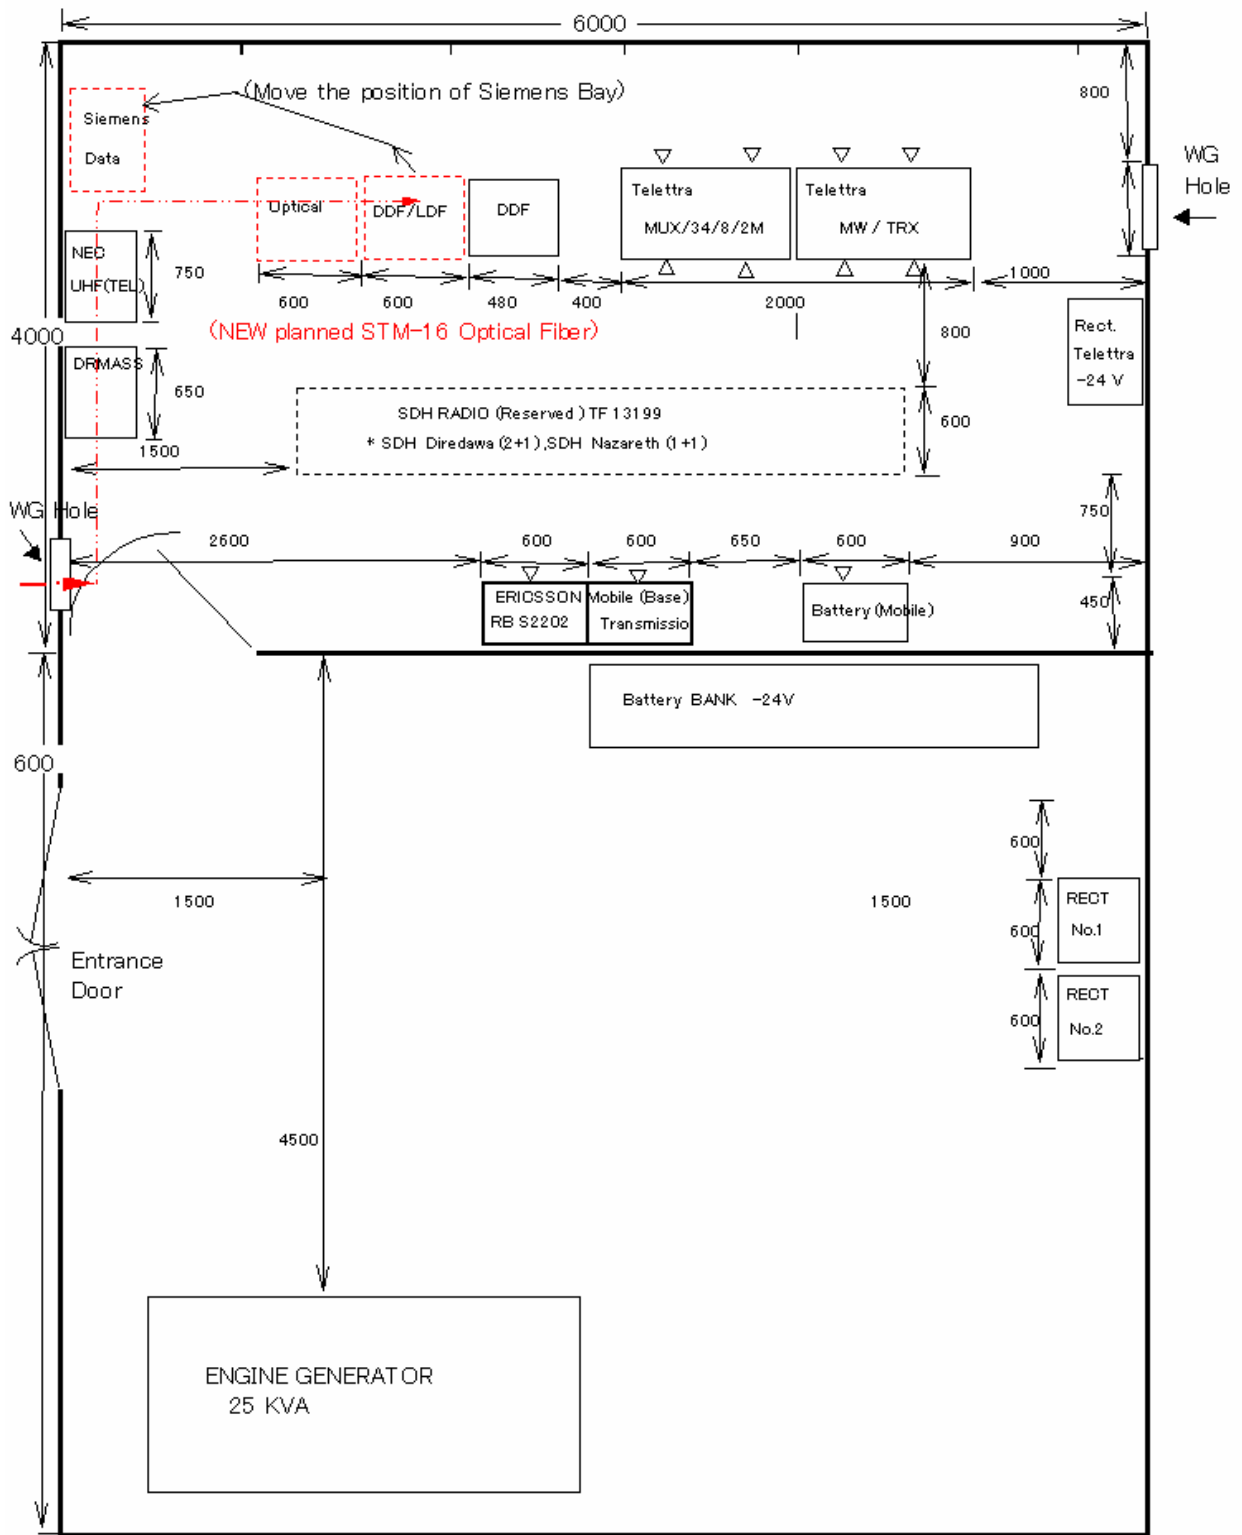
RADIO/MUX ROOM Planned Installation Place
